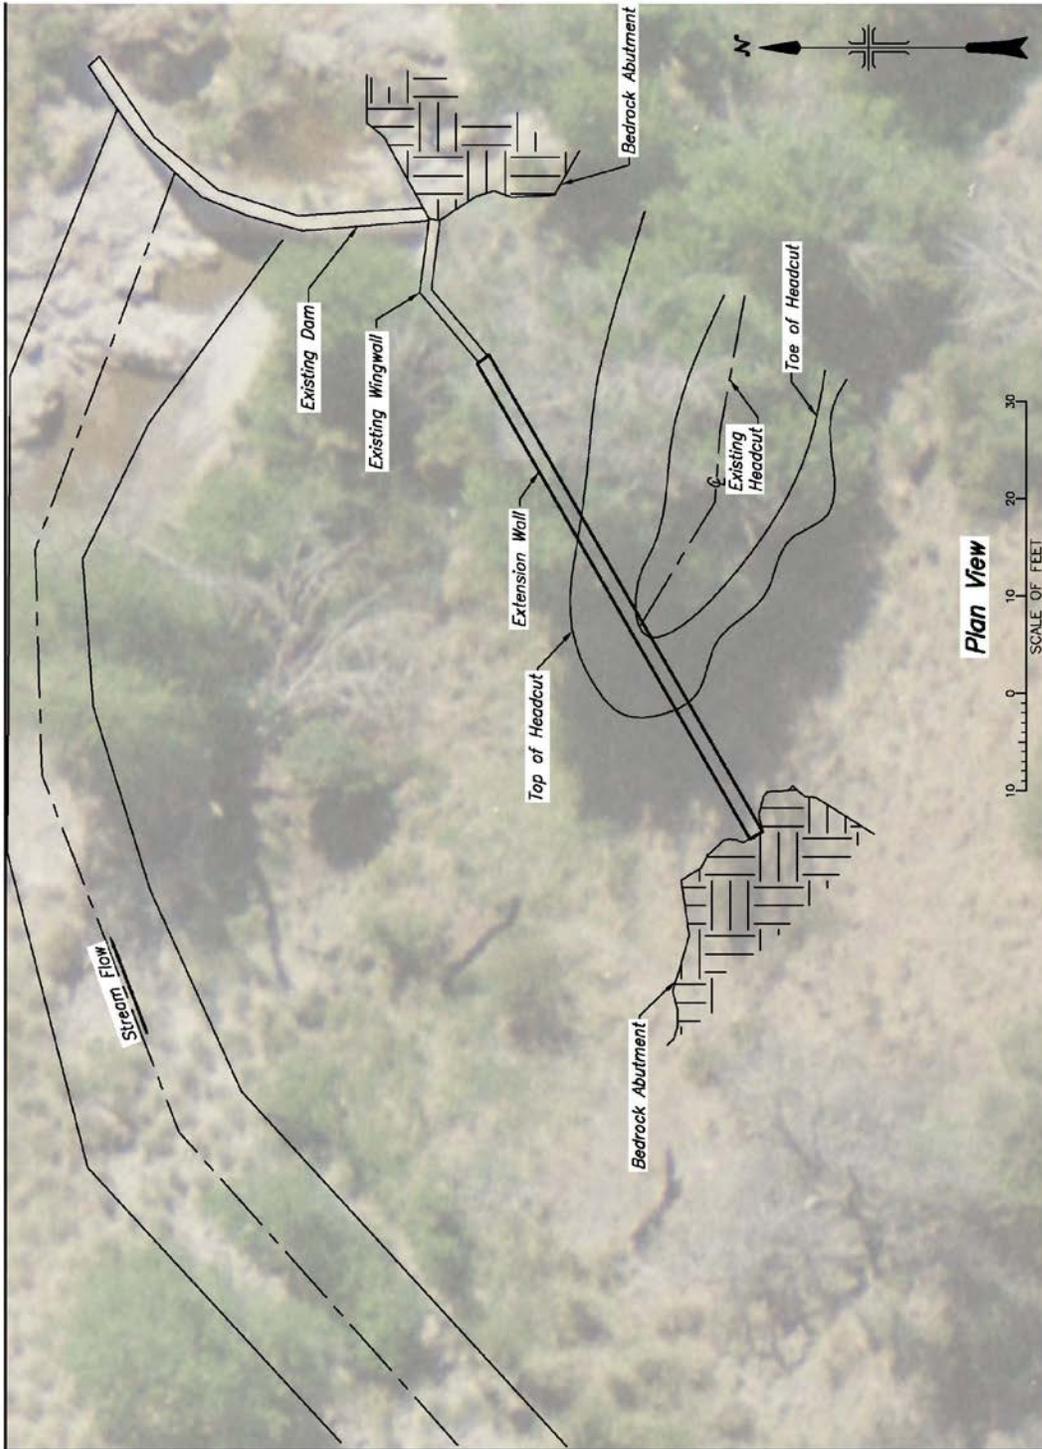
Plan view of proposed wing wall extension at upper BLM dam.
